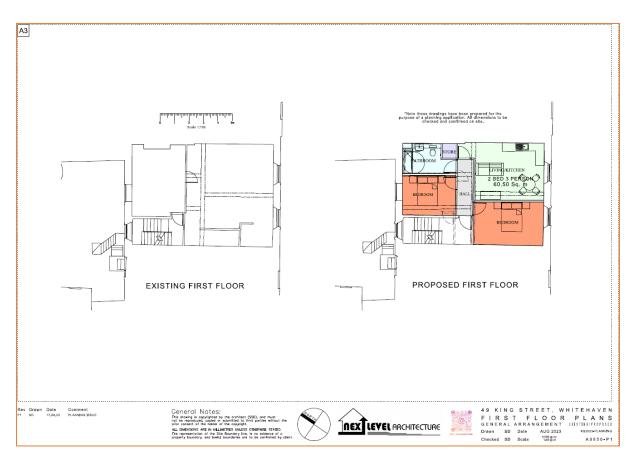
Existing and proposed first floor plans (Source: Next Level Architecture)
